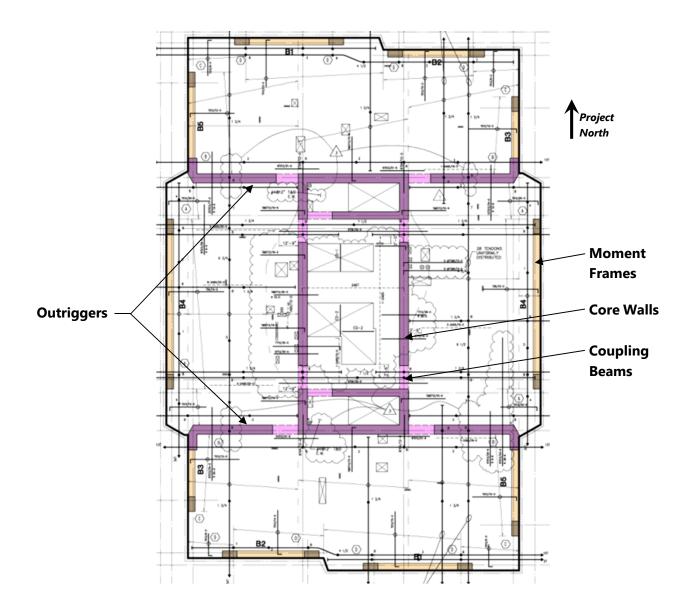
Typical Tower Floor Plan Highlighting Key Structural Elements (Source: Original Design Drawing S2-1.42.01)
